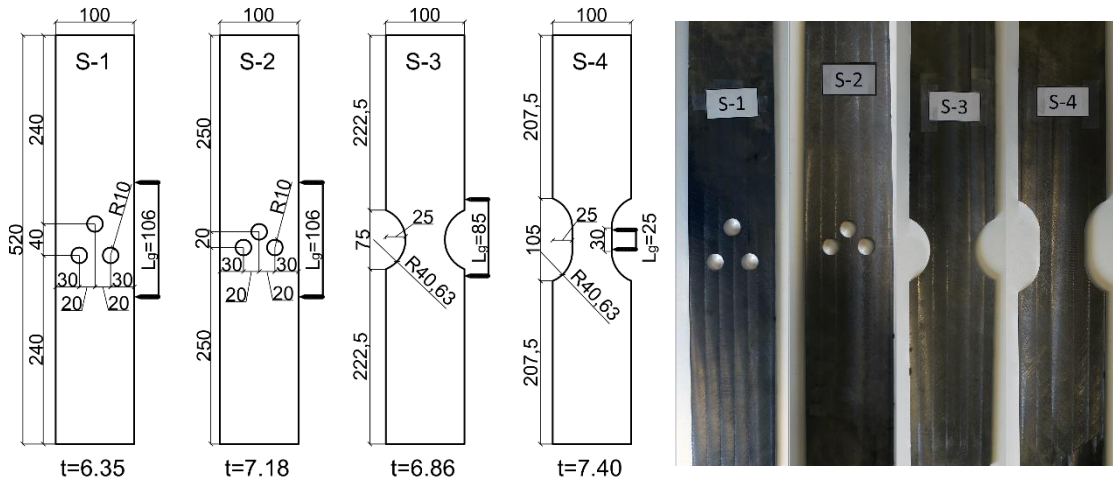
Configuration of the pull-plate test specimens taken from IPE200 specimens (all dimensions are in mm)
